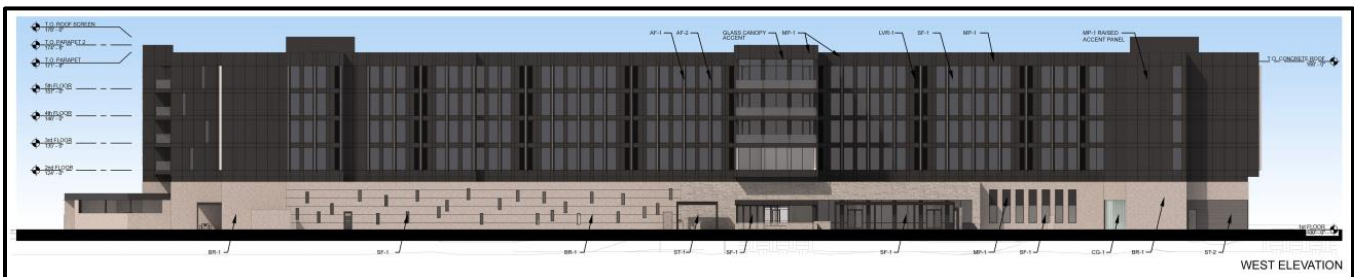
Proposed west side Elevation (facing Spirit of St. Louis Blvd.)
